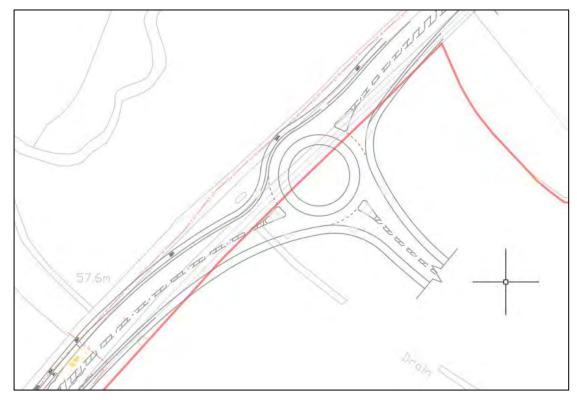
Existing UKPN Cables (in red) that may require protecting or diverting
